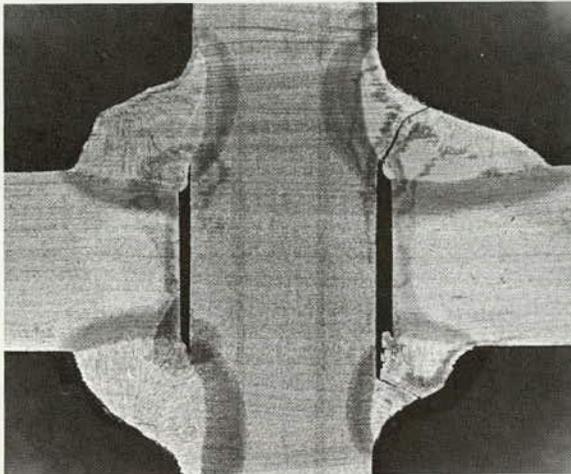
Gusset-stiffener connection adjacent to cope—beam 15 ($S_r = 21$ ksi), detail 1 showing cracks in weld.
